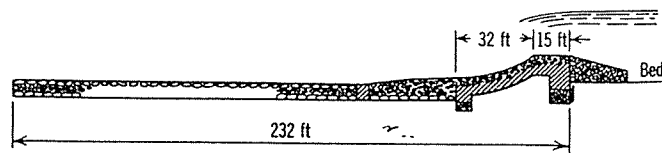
Dauleshwiram Dam, India. (Item 2, Fig. 17, p. 1551, *American Civil Engineer's Handbook*, Merriman and Wiggin, John Wiley and Sons, New York, 1946.)
